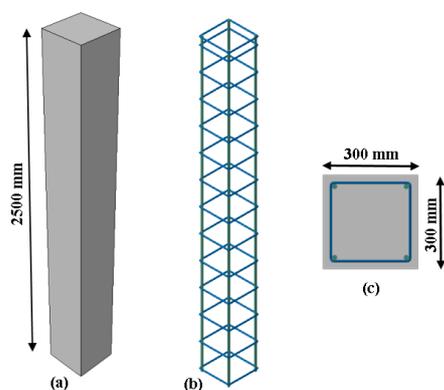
(a) Geometry of the reference column; (b) Reinforcement details; (c) Cross-section.
